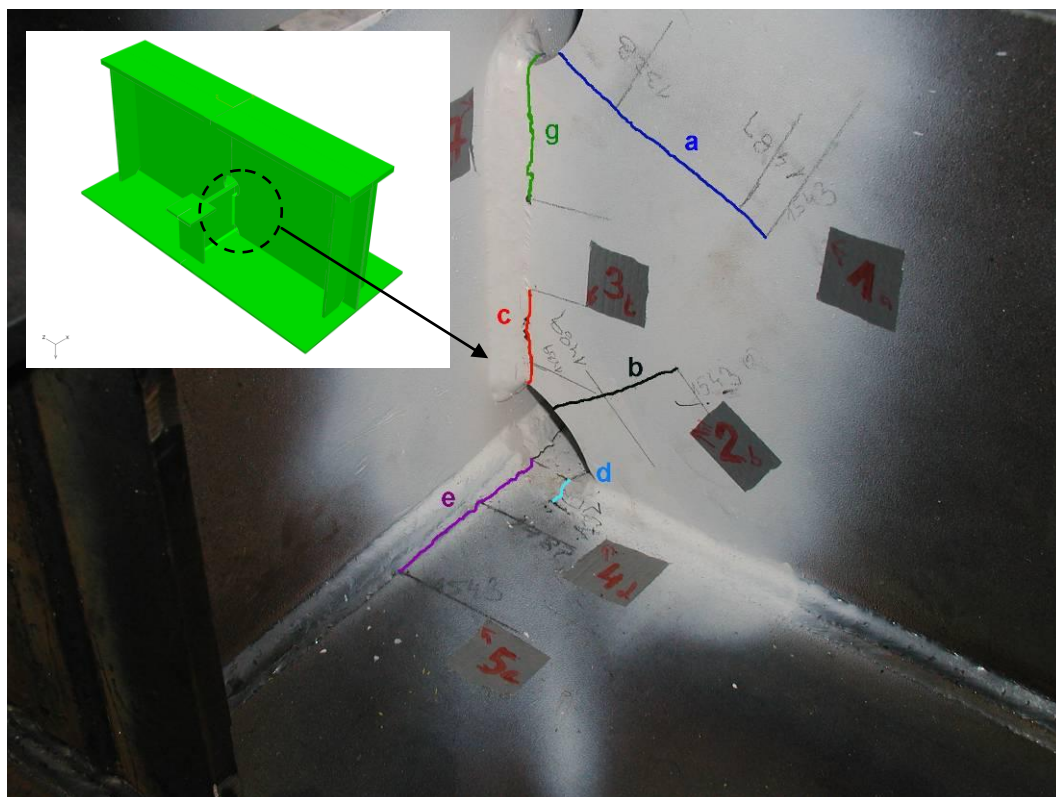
Fatigue cracks in specimen A2.
